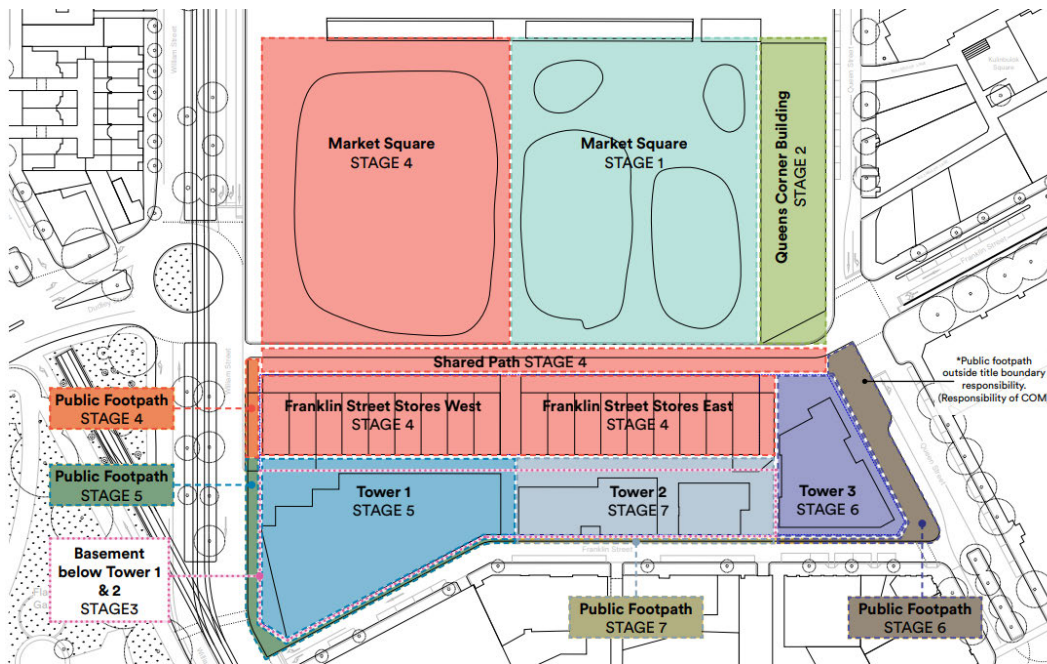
Staging Plan, (Source: Lendlease Development Plan)
